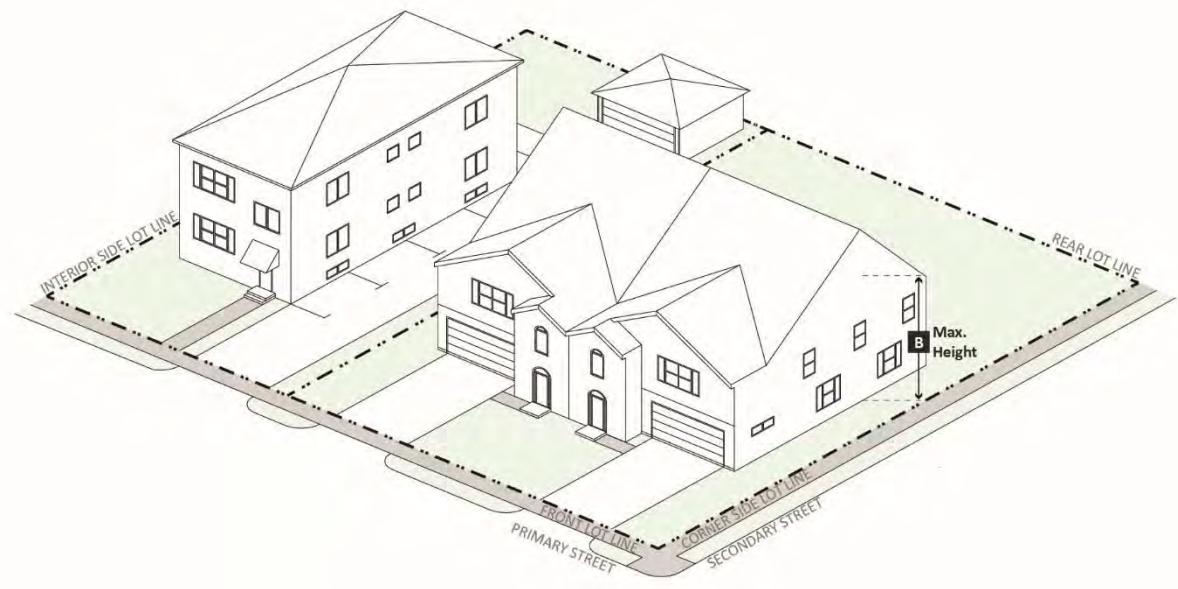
R-5 District Requirements: 3-D View
